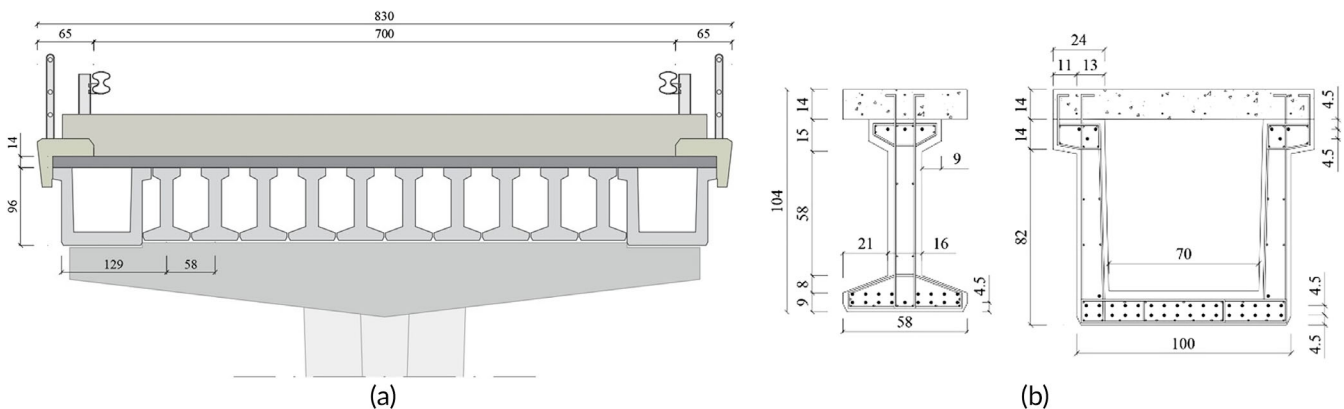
Cross-sections of (a) whole deck and (b) PC girders (cm).
